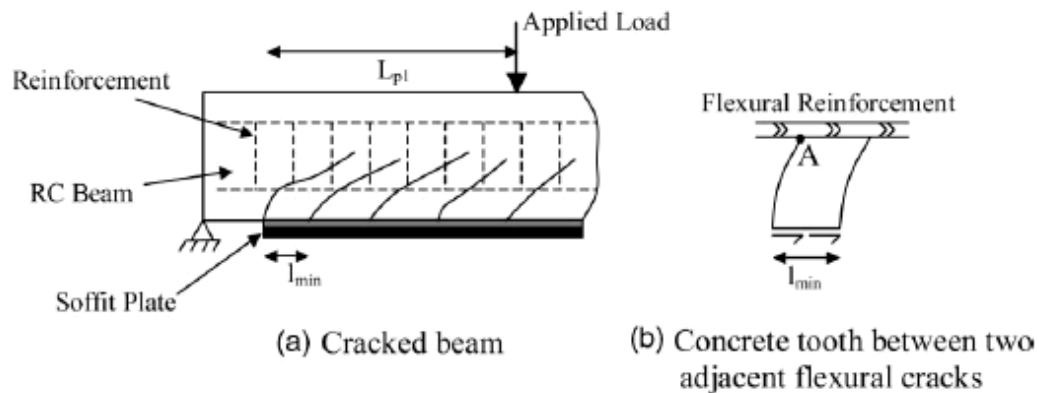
(a) Cracked beam (b) Concrete tooth between two adjacent flexural cracks
